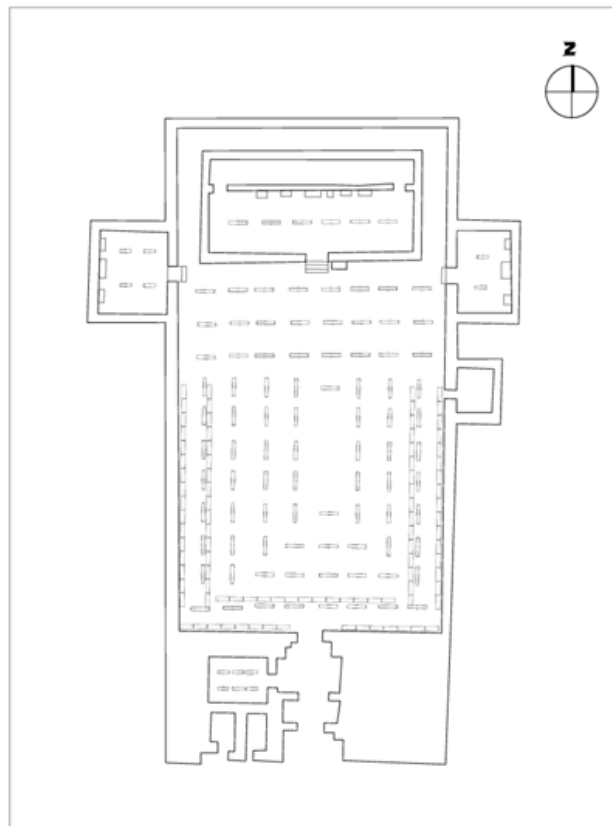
Floor plan of Parkhang Chenmo, redrawn by the authors from (Su 1996).
